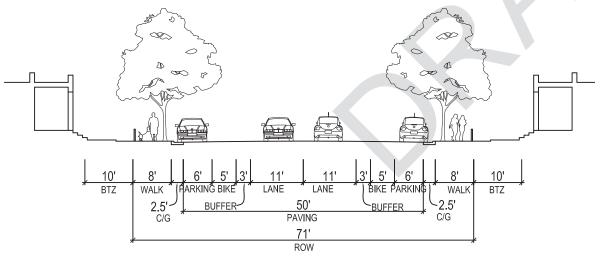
Street Type 4.2: Park Edge Double-Loaded Cross Section
